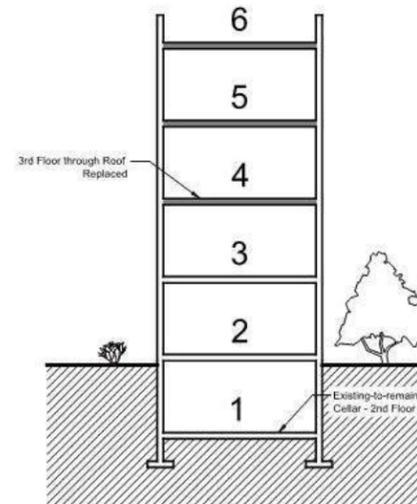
Proposed four-story building with three new floors and three existing floors. 100% increase in Floor Surface Area - is not considered an Alt 1 required to meet NB requirements.
